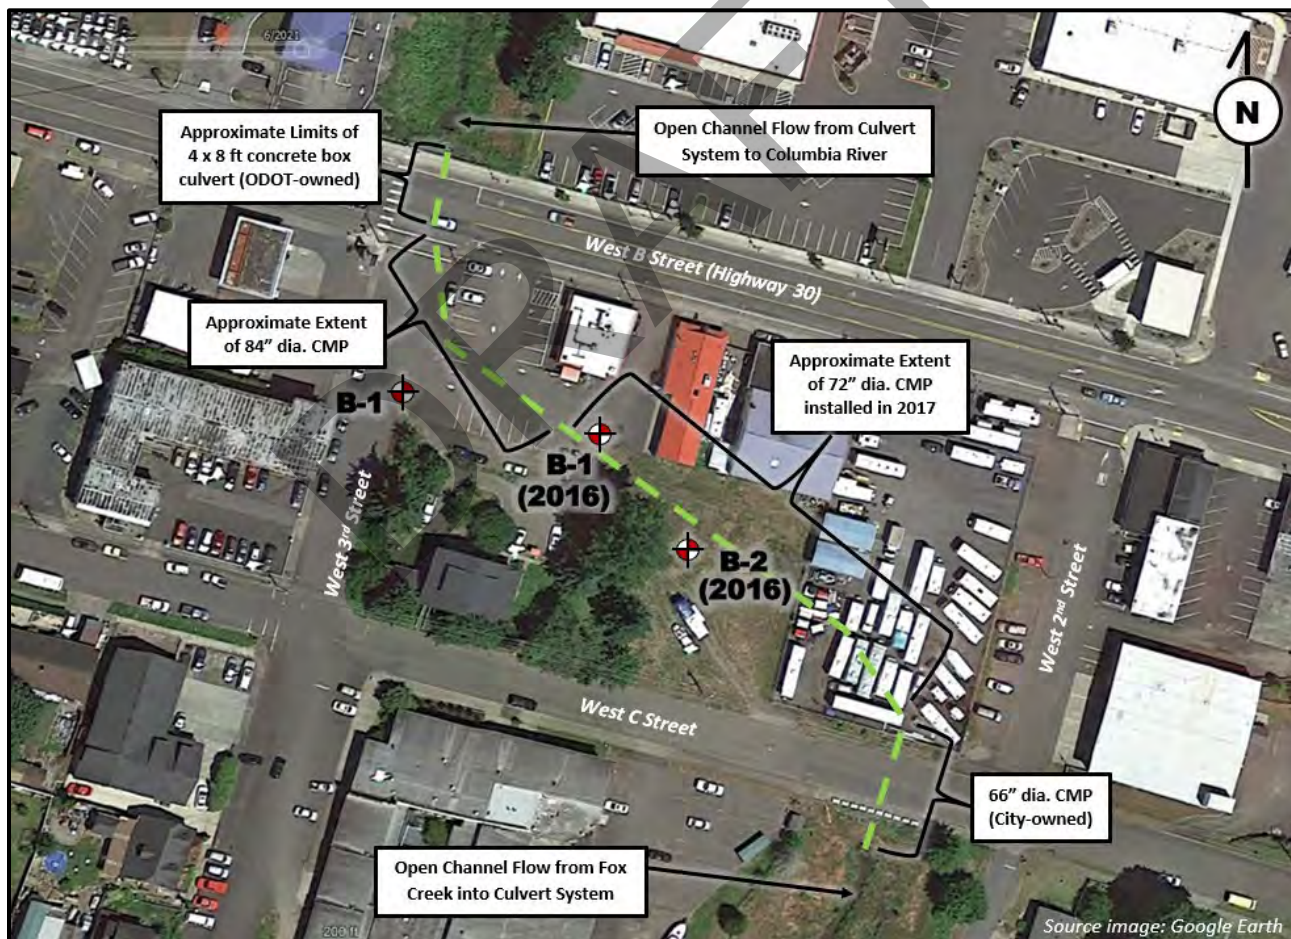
Site Plan of existing culvert system (approximate alignment shown in green) and soil boring locations.
